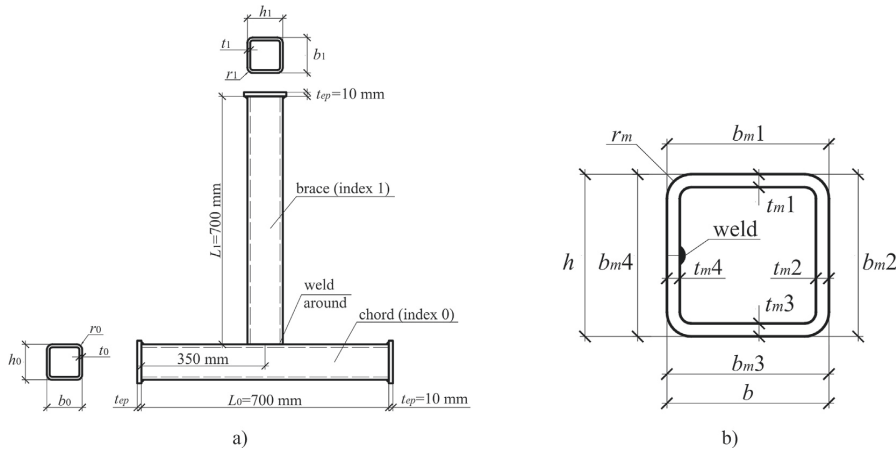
Test specimen: (a) overall view, (b) measured dimensions of tube. Plate 1 corresponds to compressed flange of brace.
